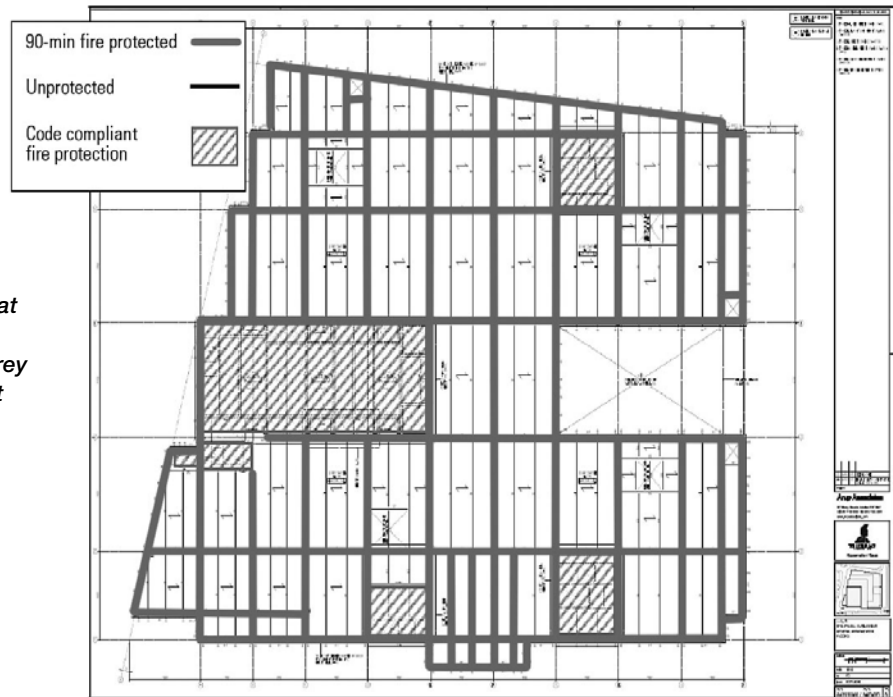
Floor arrangement at Ropemaker Place in London. Beams highlighted in thick grey are fire protected; beams not highlighted are unprotected. This solution represents the state of the art capability in structural fire engineering. Courtesy of Arup Fire.
